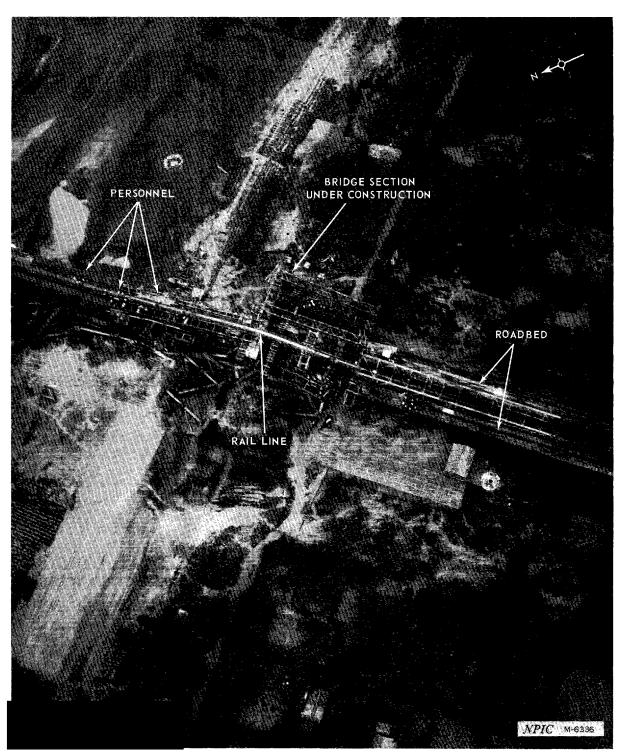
PAUL DOUMER RAILROAD/HIGHWAY BRIDGE, HANOI, NORTH VIETNAM
